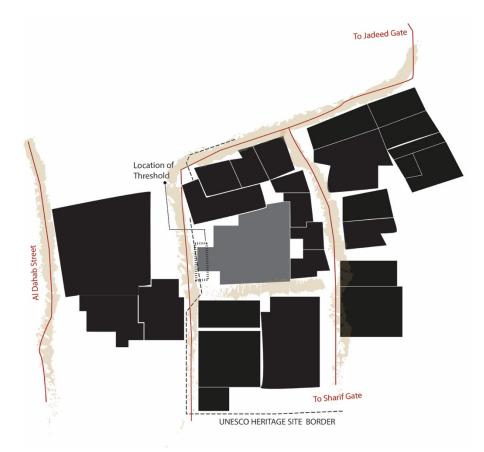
Site plan showing Jukhdar house and the surrounding houses. Source: Author.
